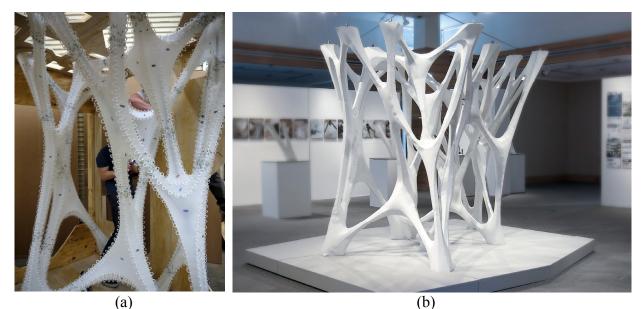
(a) Formwork during assembly; (b) Final prototype after formwork was removed
